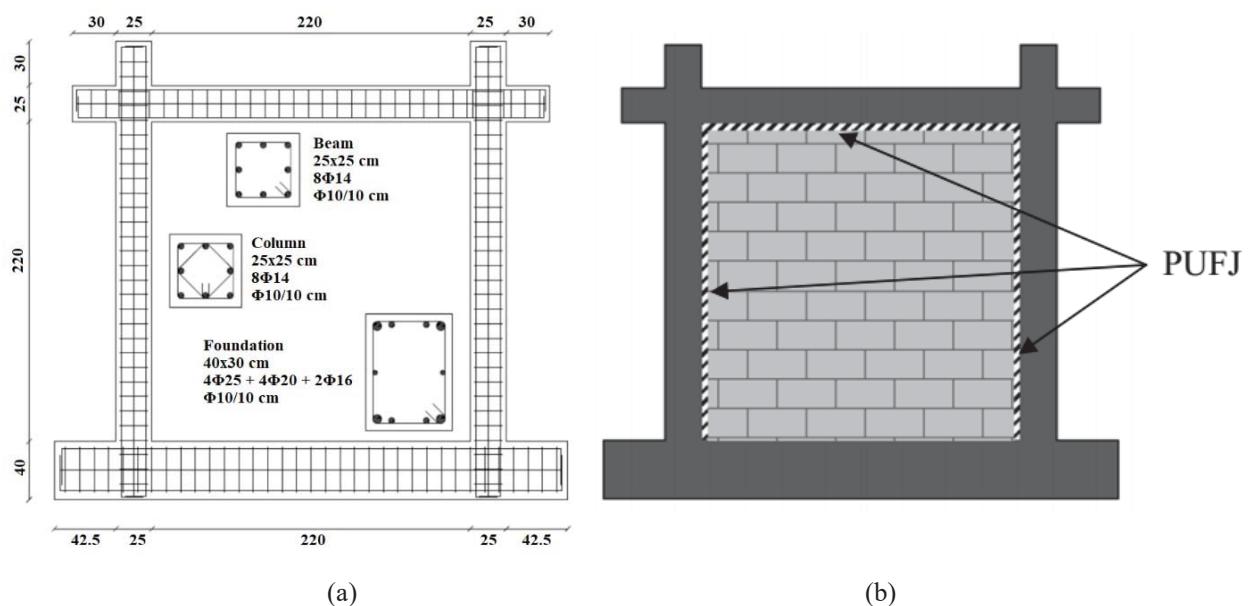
(a) Dimensions of the RC frame and detailing of internal steel reinforcement and (b) Specimen B2 with 3-sided polymer joint applied on existing infill (adapted by [1]).
